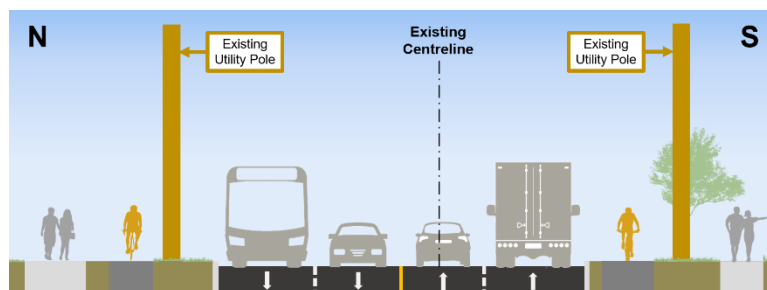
Illustration showing proposed lane, multi-use trail and sidewalk changes on Ellesmere Road between Military Trail and Meadowvale Road, facing west.
